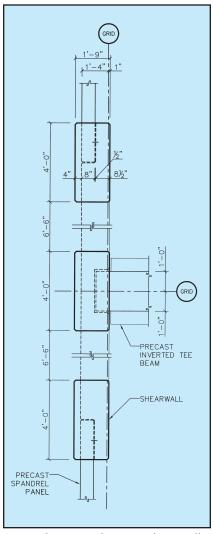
Plan view of exterior shear wall used on upper floors shows the openings that were added into the oneunit piece.
